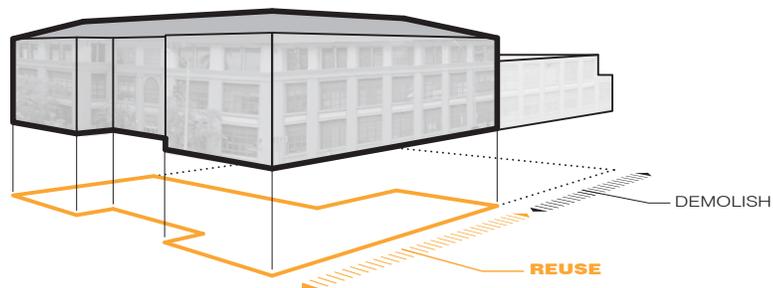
DIAGRAM OF THE NEWS BUILDING'S REUSED FLOOR AREA
